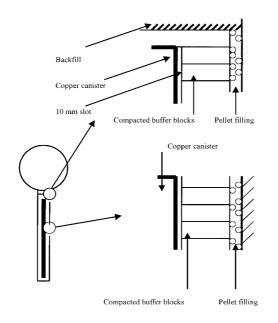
KBS-3 deposition hole with copper-shielded canister embedded in compacted buffer blocks and bentonite pellets filling.
